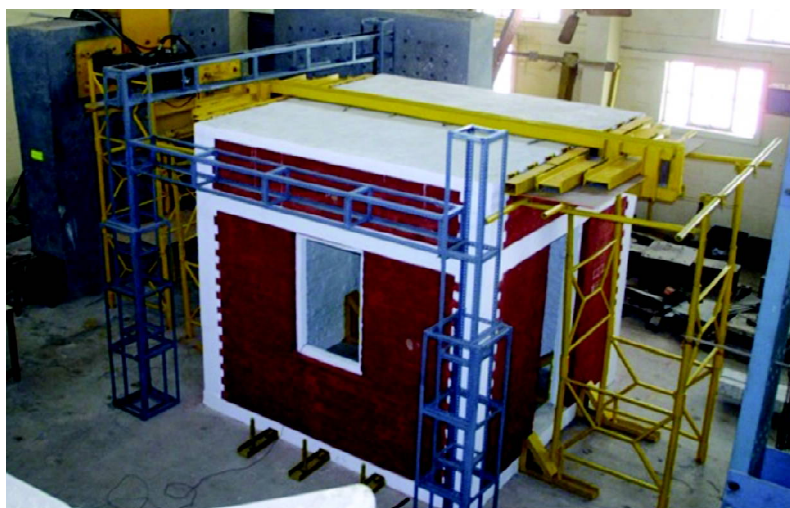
Full-scale confined masonry building model subjected to lateral cyclic load
